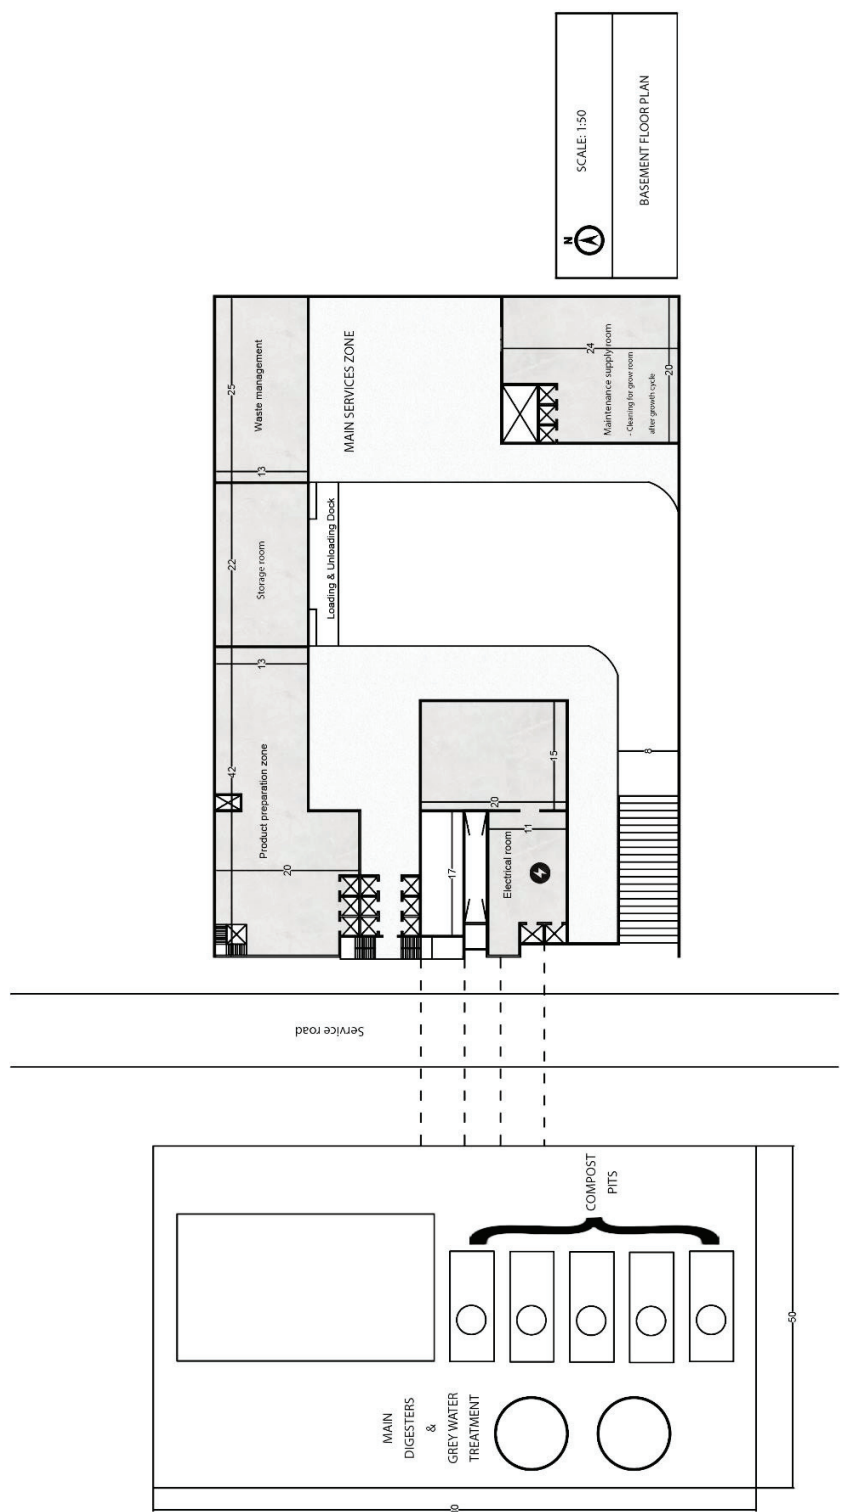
Basement Floor plan (Illustrated in Adobe photoshop)
